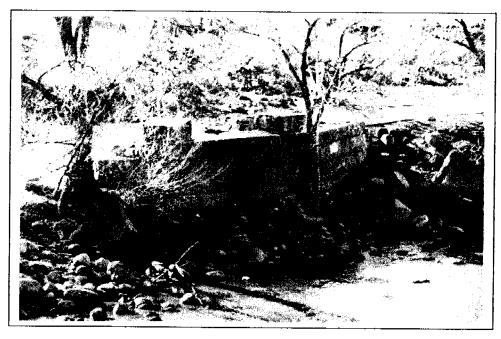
Section N, south bank between Virginia Street and Center Street, camera facing southeast, 10/24/01.
